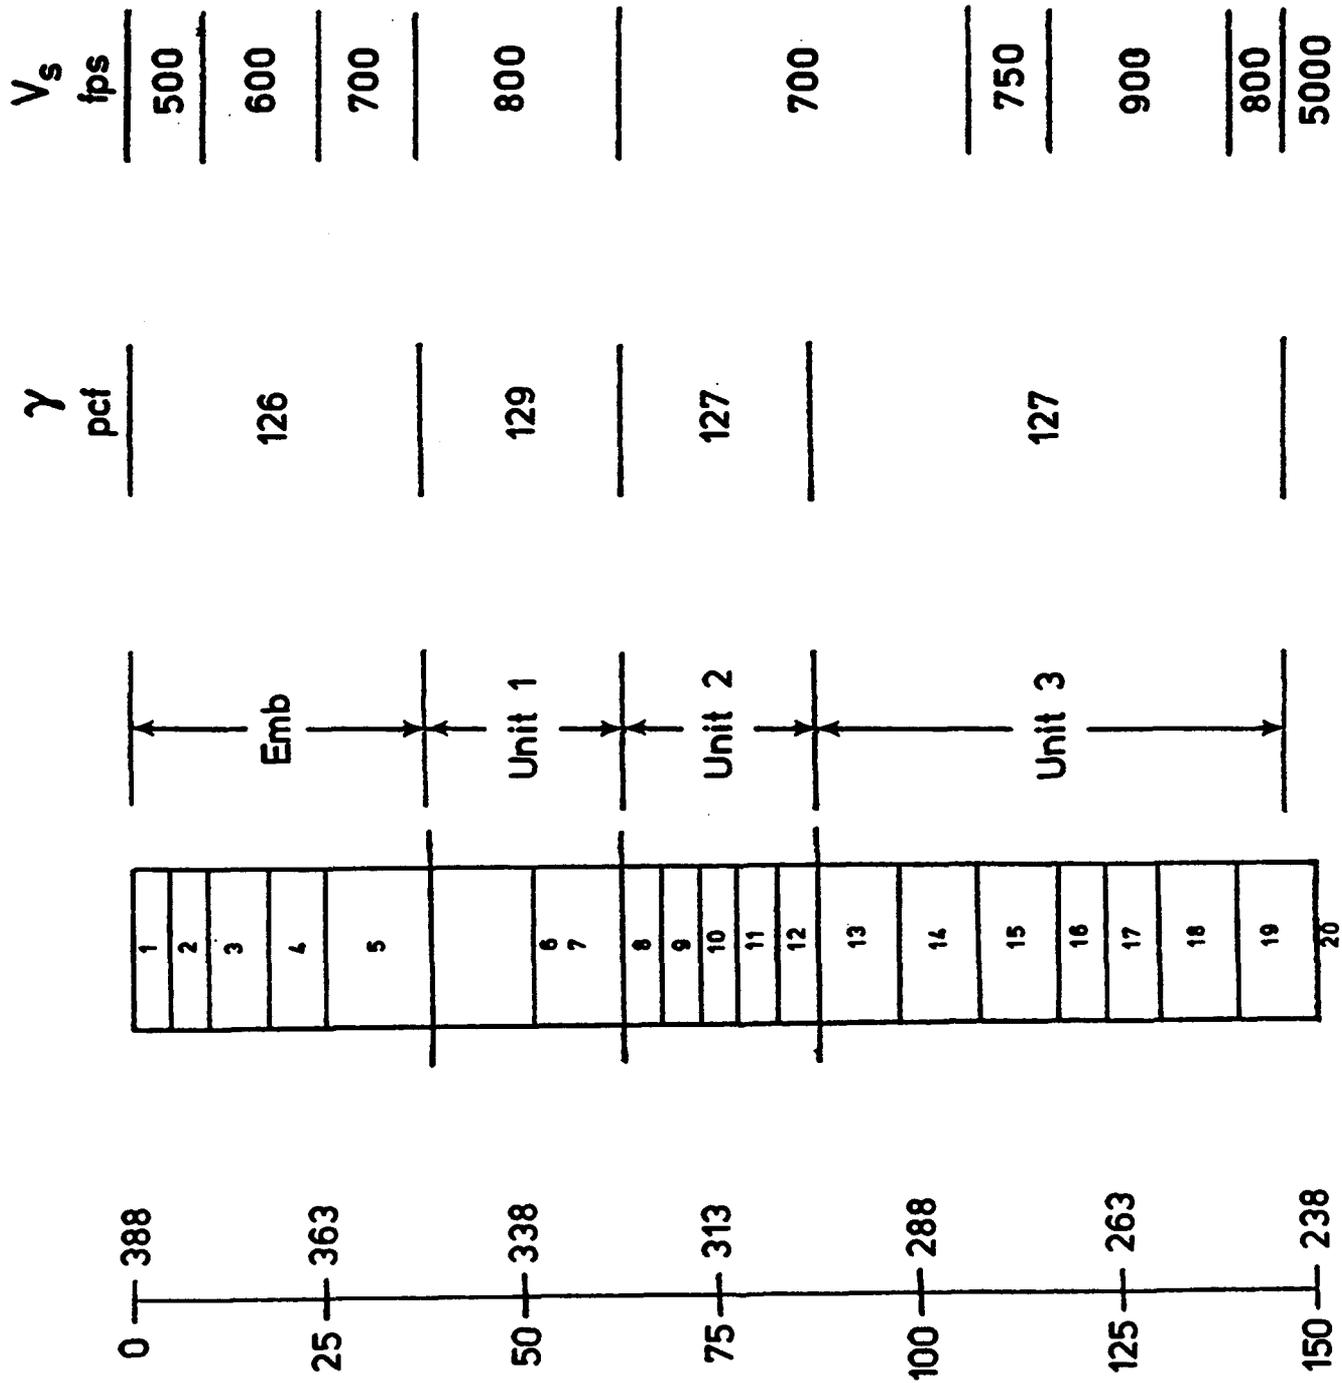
Profile 4 - main embankment profile at a point on the centerline of the embankment.
